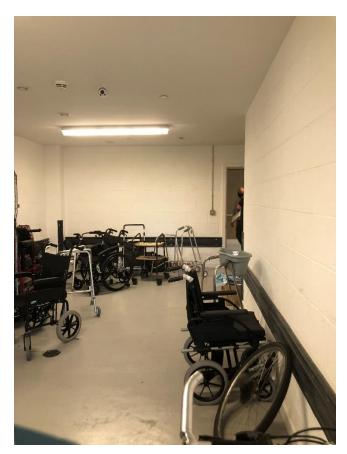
Building 3 images showing powered external door, wall protection buffer rails, internal door with fob operation, painted concrete walls and floors
